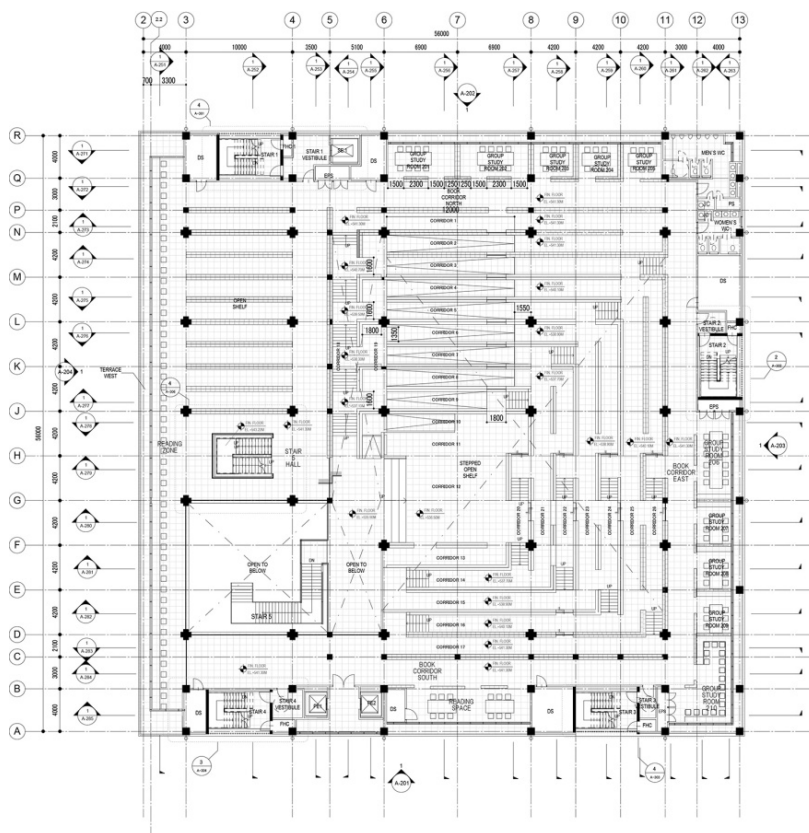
KNC 2<sup>nd</sup> Floor Plan
